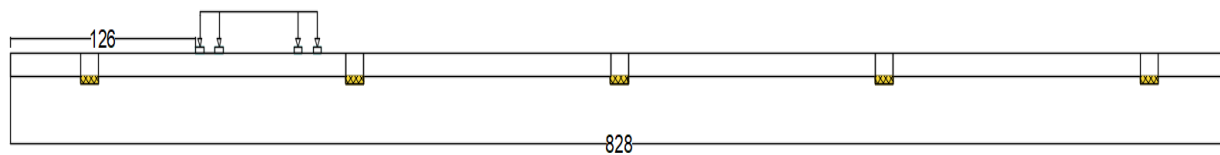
Location of P-15 truck for 15 ft girder spacing deck slab (Case 1, unit: in)
